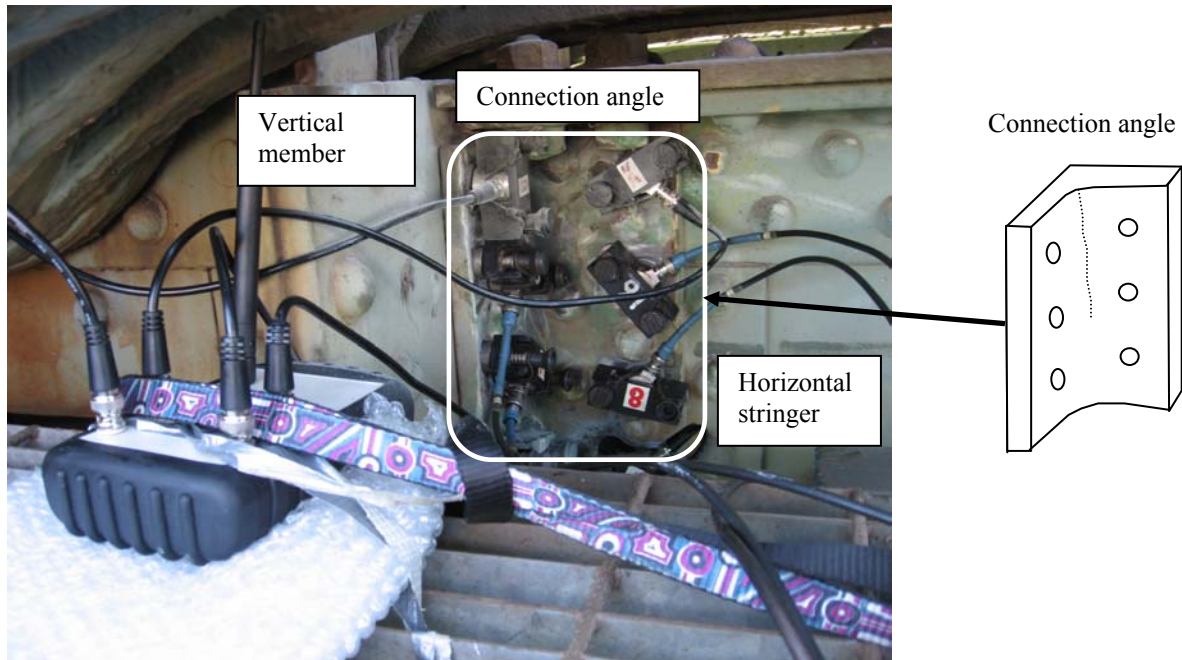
The connection angle monitored and a simplified schematic showing that the structure is a 90° angle with filleted inside corner. The fatigue crack ran vertically down the filleted mid-section.
